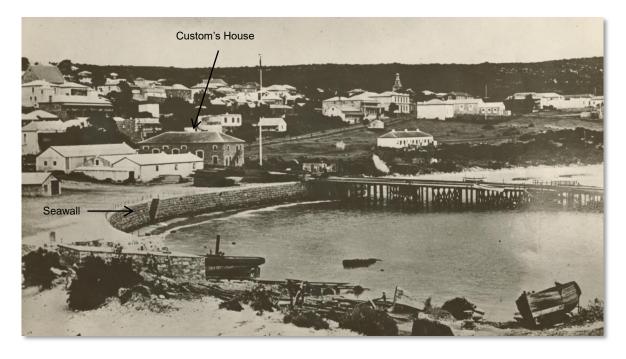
Mossel Bay harbour c. 1895-97 showing the newly constructed seawall between Harris' slipway where the steam launch is hauled out in the foreground and Pilkington's jetty. The buildings associated with the ship repair facility would later be constructed on the landfill behind the seawall (Source: Cape Archive, M719).
